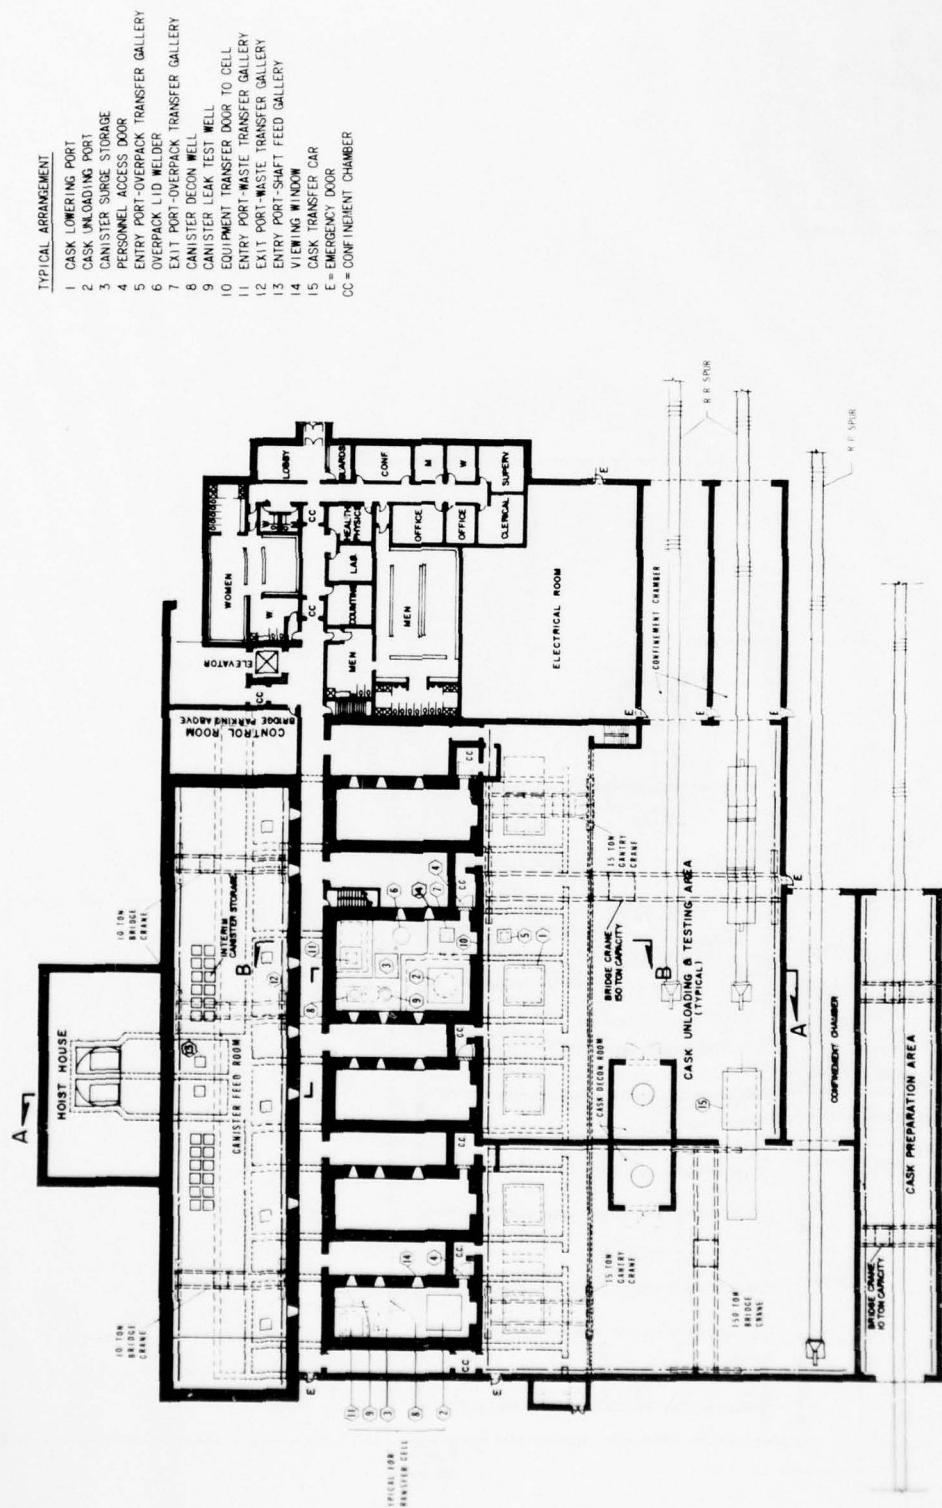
Canistered Waste Building Ground Floor Plan, Once-Through Fuel Cycle, Repository in Salt
